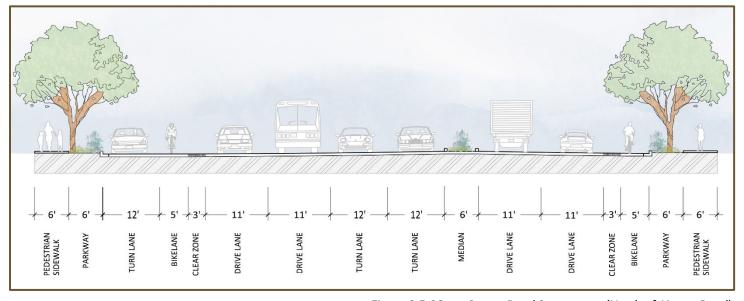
Cactus Road Streetscape (North of Airway Road)
